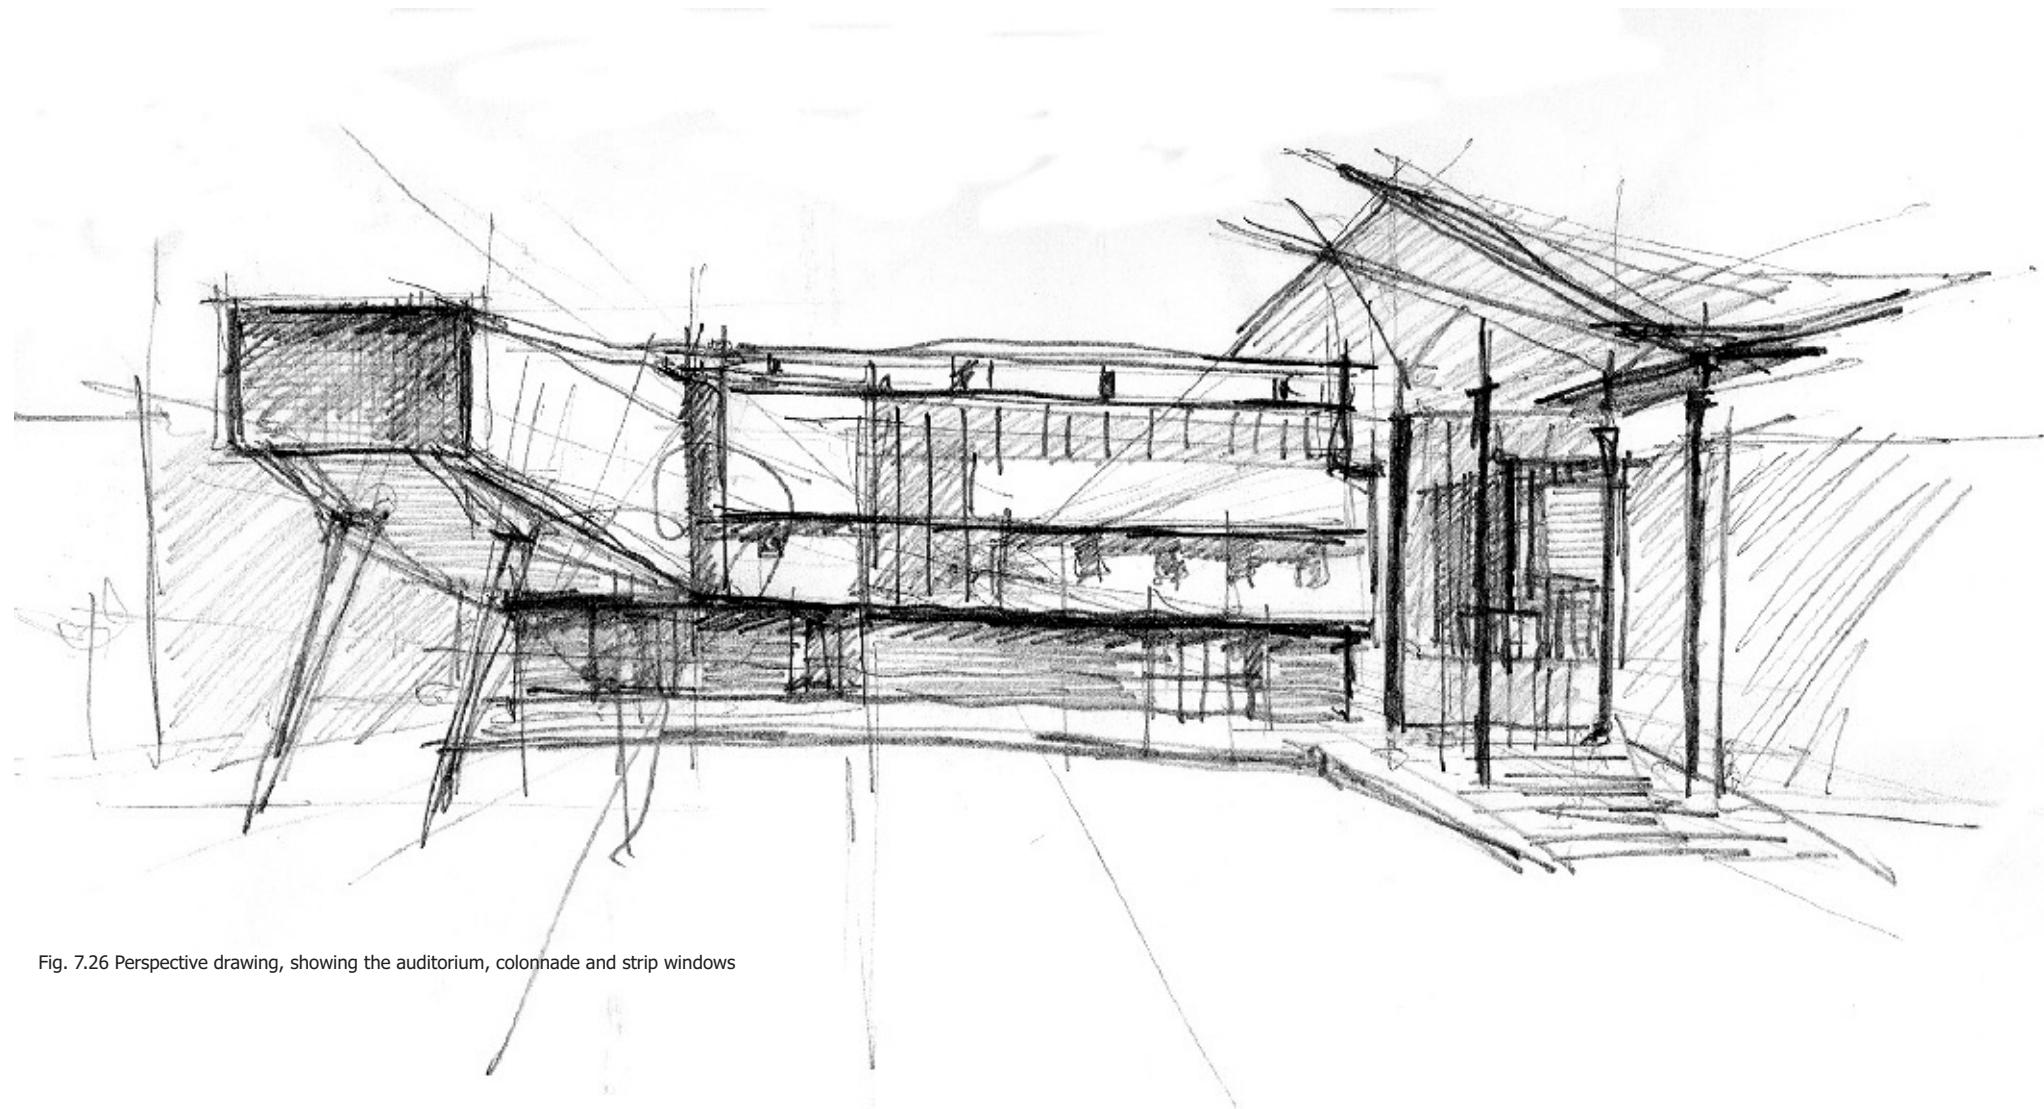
Perspective drawing, showing the auditorium, colonnade and strip windows
